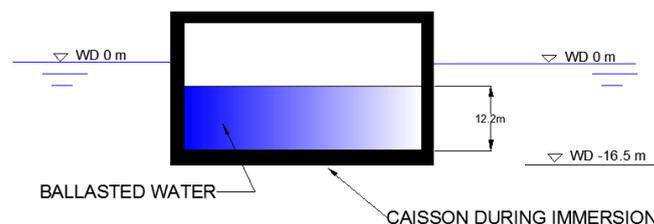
18. Caisson during immersion to WD-16.5m at final location
